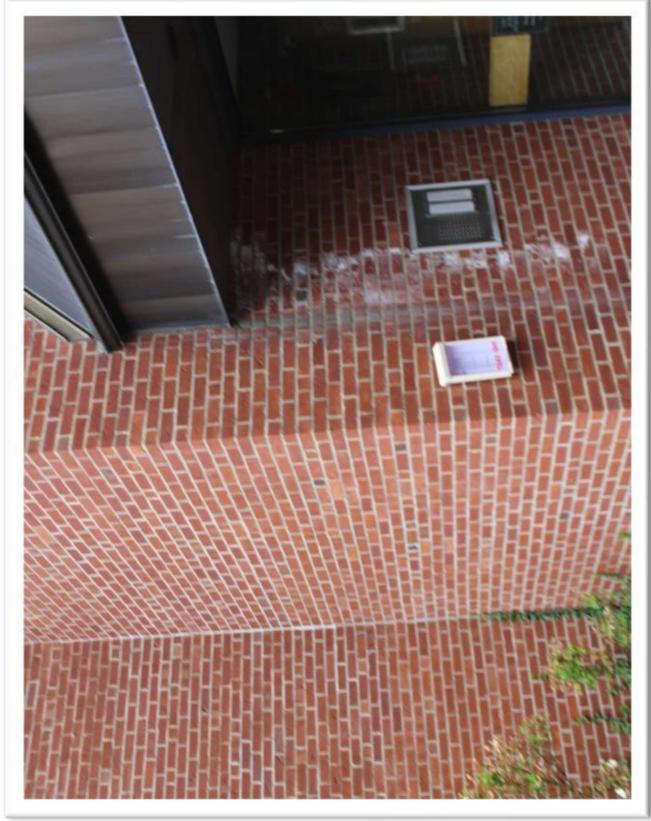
Presents of efflorescence on surface of brick at possible leak location.
